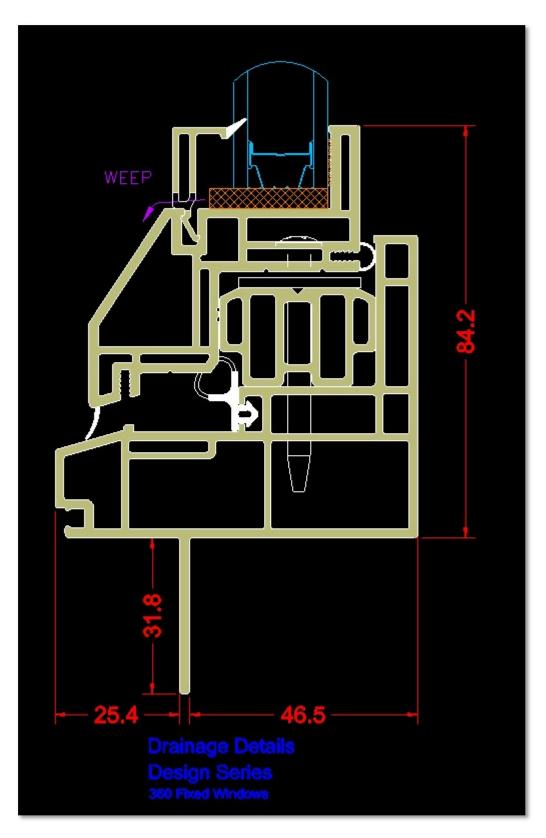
PLYGEM WINDOW WEEP DETAIL CROSS SECTION 2
